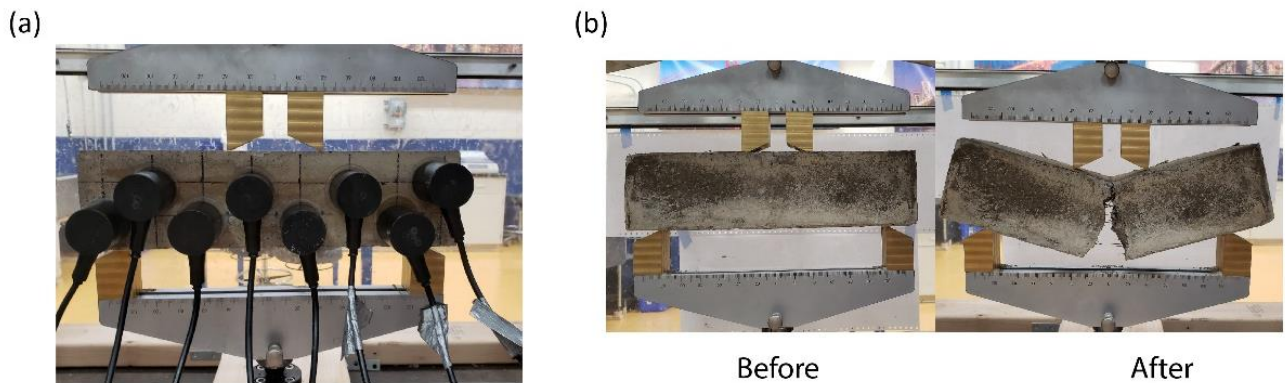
4-point load tests of laboratory beams containing prestressing rings, a. with acoustic emission sensors, and b. load to failure
